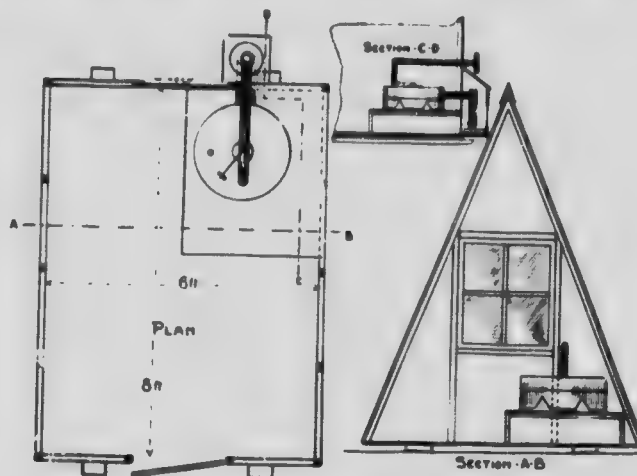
BROODER COLONY HOUSE. PLAN AND SECTION, SHOWING CONSTRUCTION
